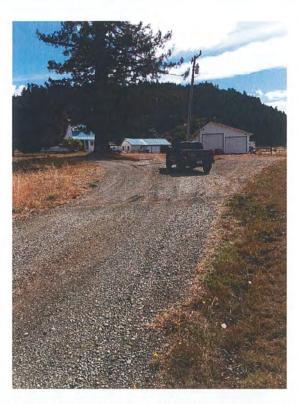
RP 8. typical section of Chambers Rd (non-County maintained). Large turnout areas adjacent to structures. Vehicle traveling east, phot taken east.
